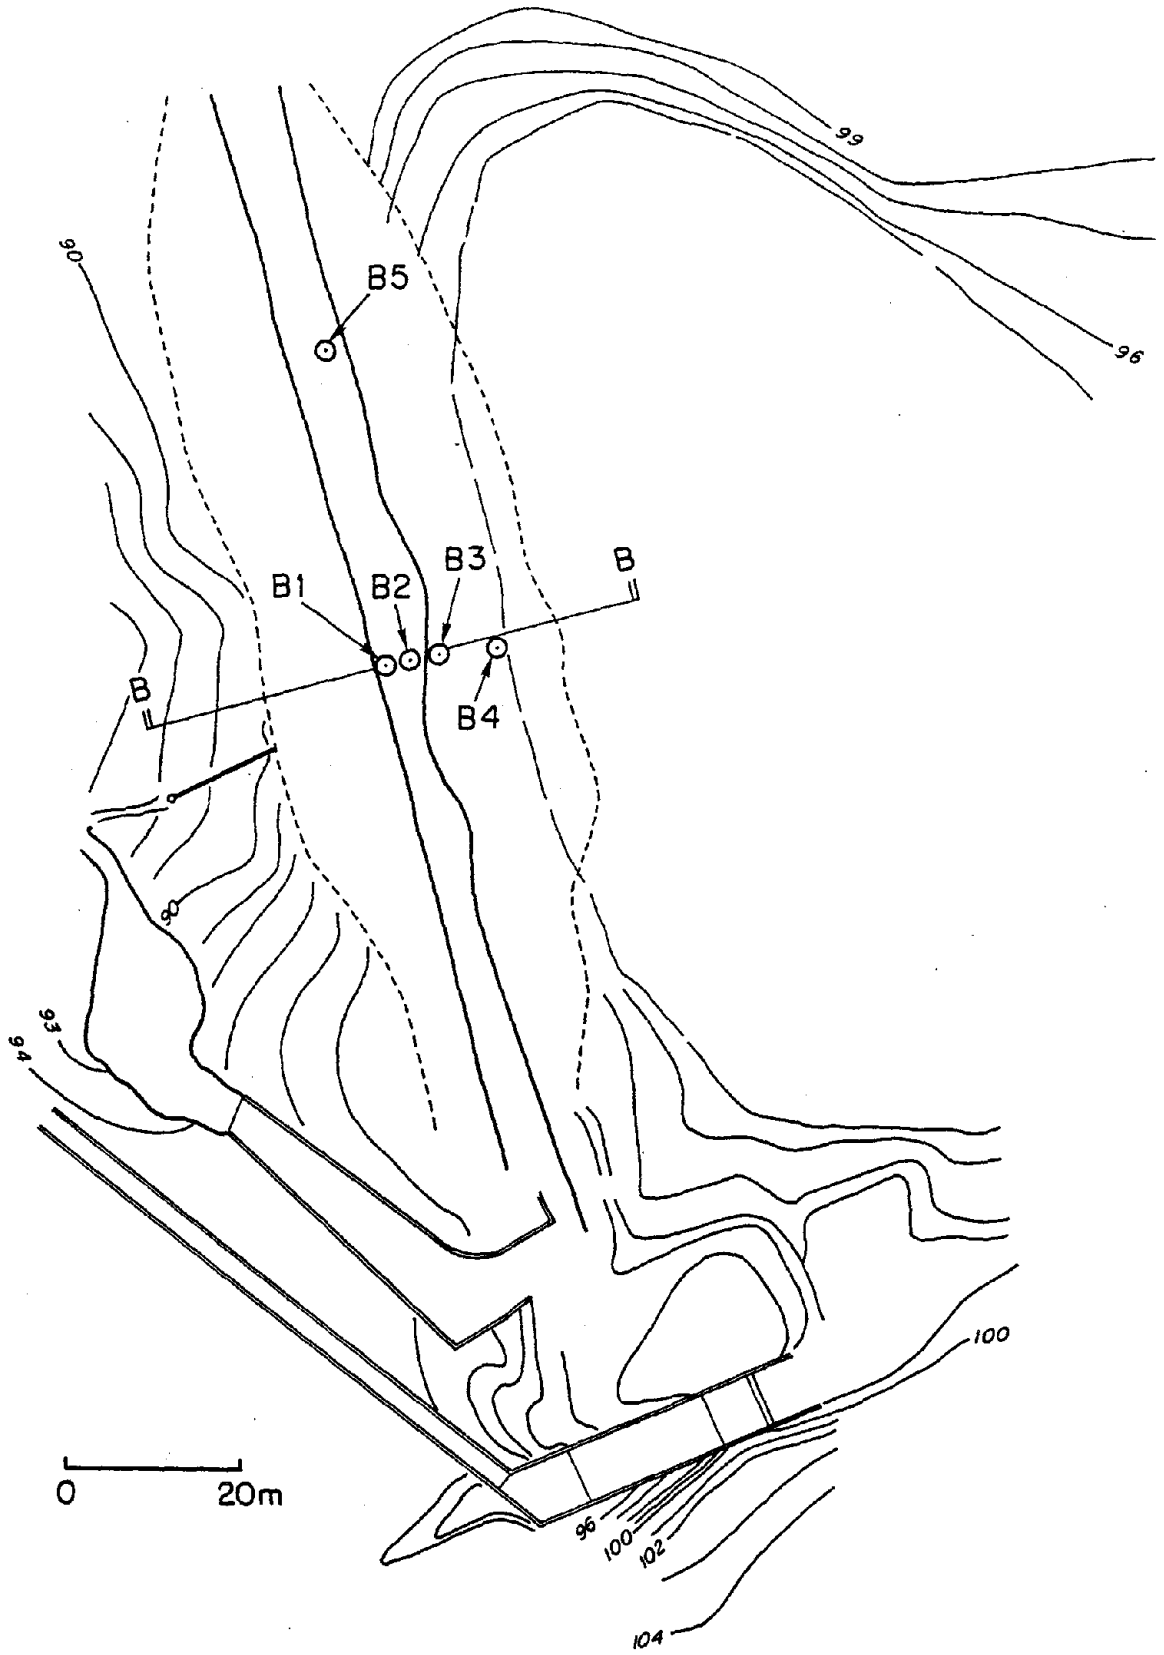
PLAN OF LA PALMA DAM SHOWING BORING LOCATIONS
